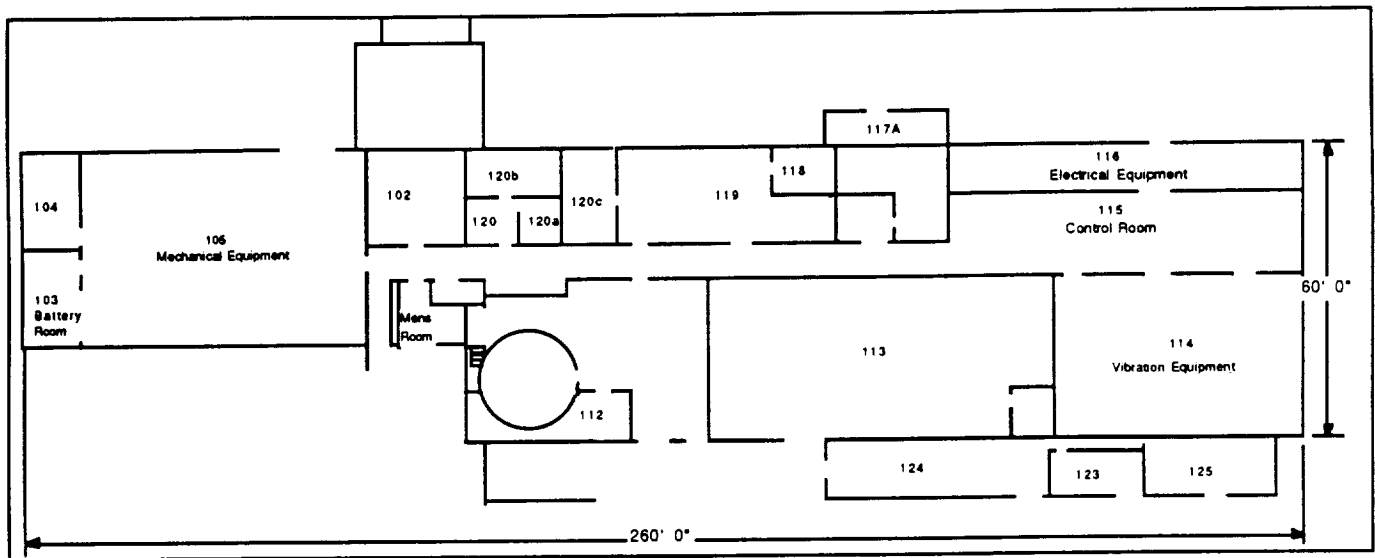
BUILDING 4476, MSFC, FIRST FLOOR
